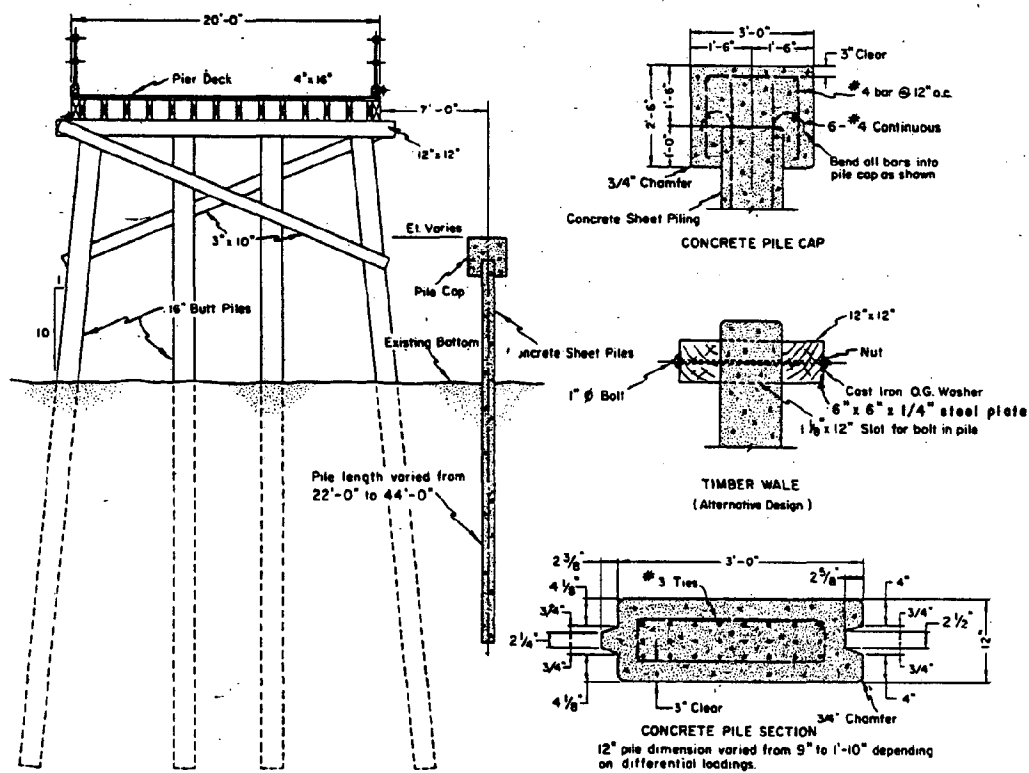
Prestressed Concrete Sheet-Pile Groin
